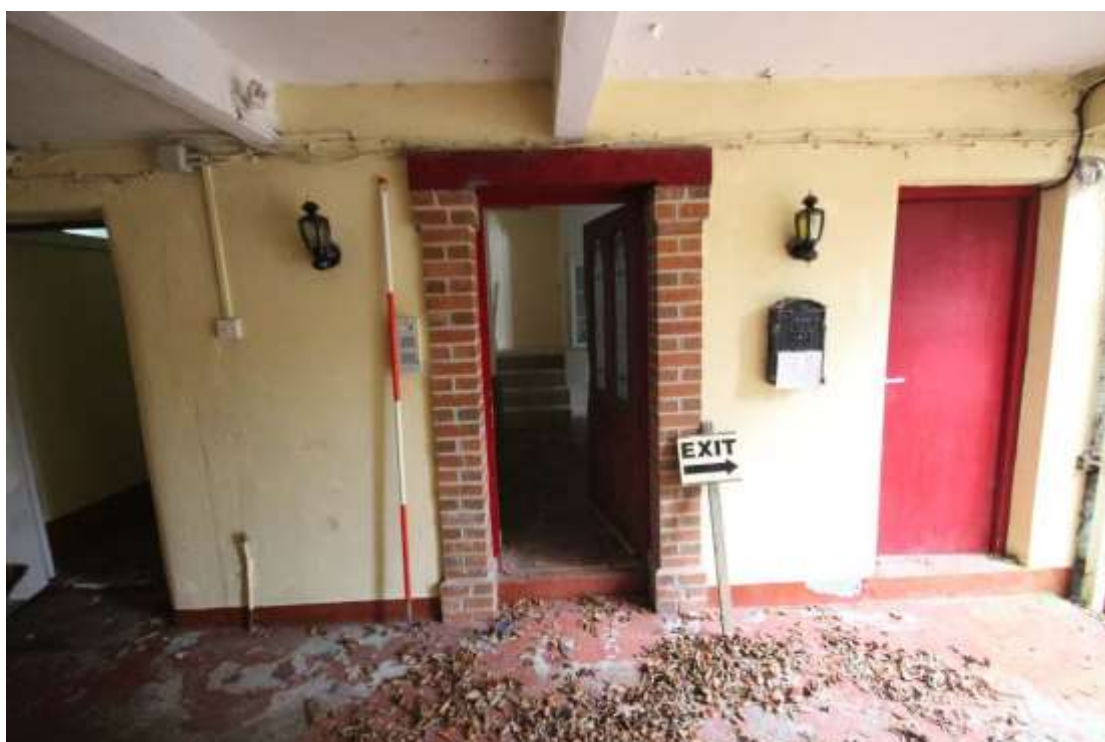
View of the western elevation of the store room, facing west. Scale 2m. This was the original exterior wall of Block A.
